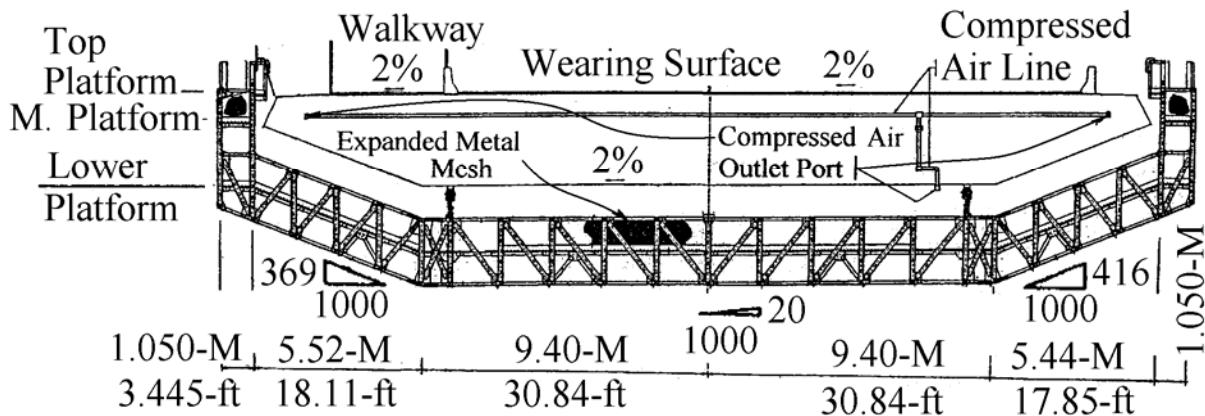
Figure M. Steel Details—Tub Girders and Bridge Maintenance Access for AZMB
